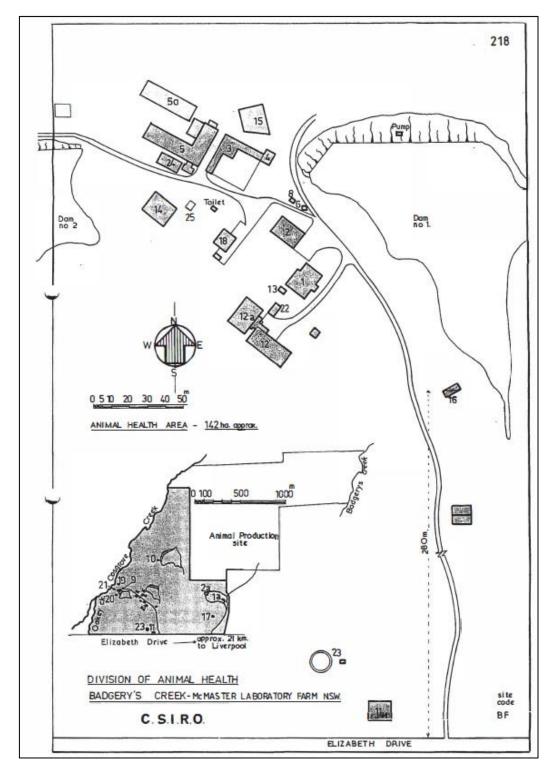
CSIRO Badgerys Creek McMaster Laboratory – building layout Division of Animal Health, 1995 (Source: CSIRO (2020): Document part 17)
